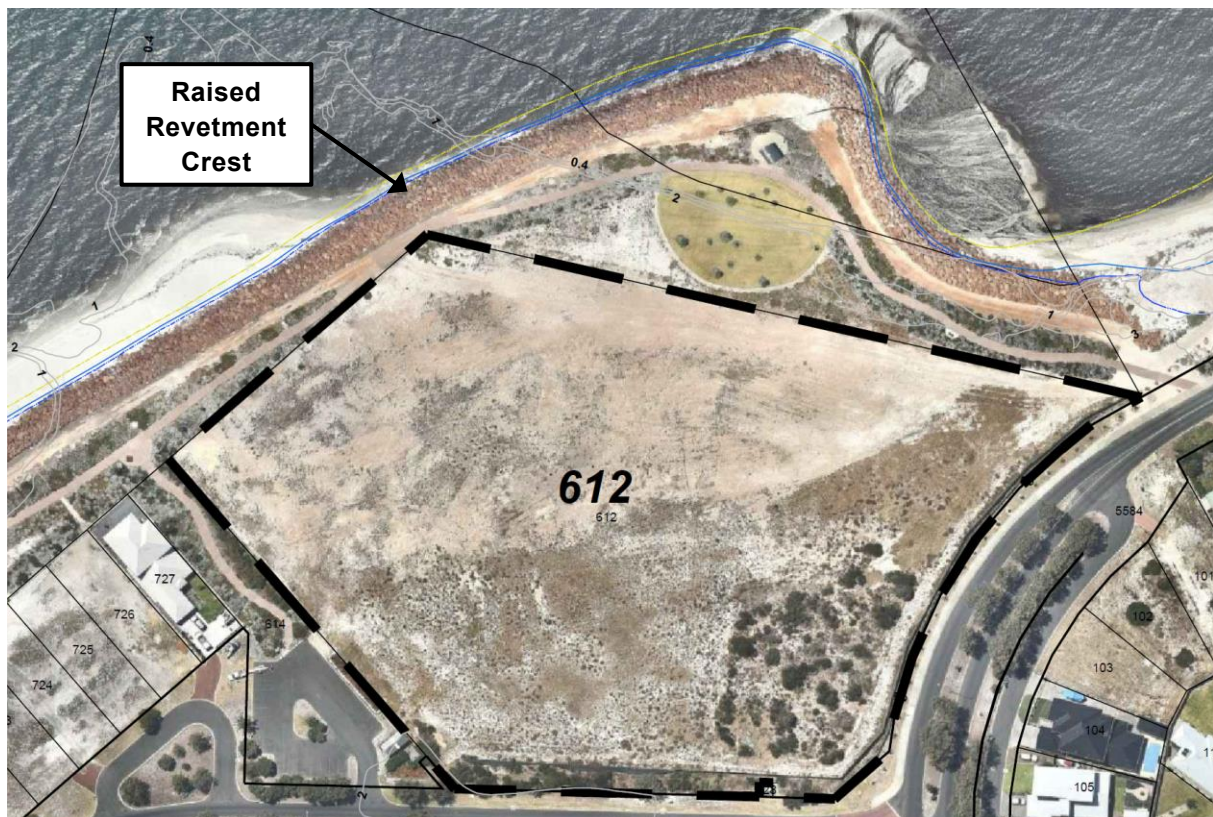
Northern Boundary of Lot 612 where Design Crest Elevation was Raised
